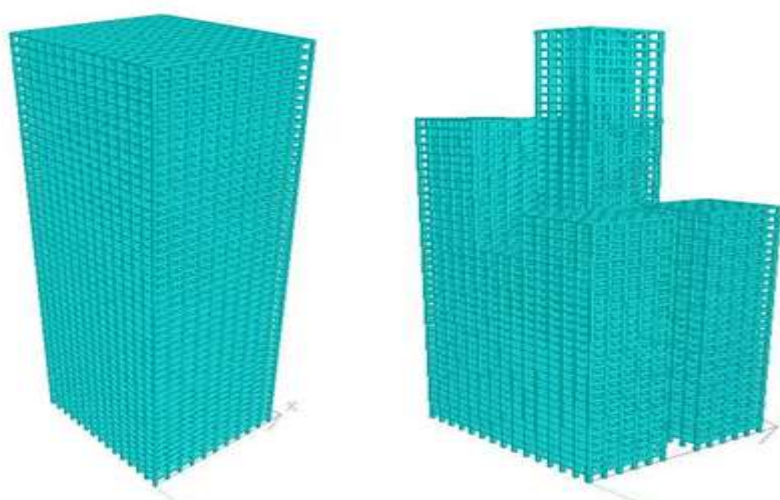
Elevation View of the Frame Tube Structure& Bundle tube structures
